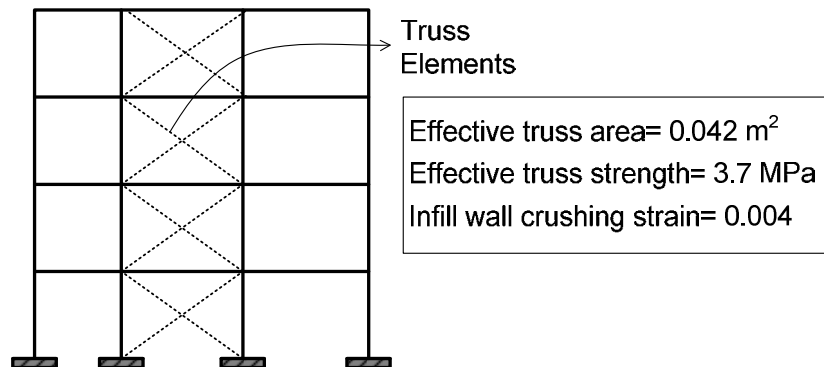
Infill wall layout and analytical model of the test and 4 story-3story frames.
